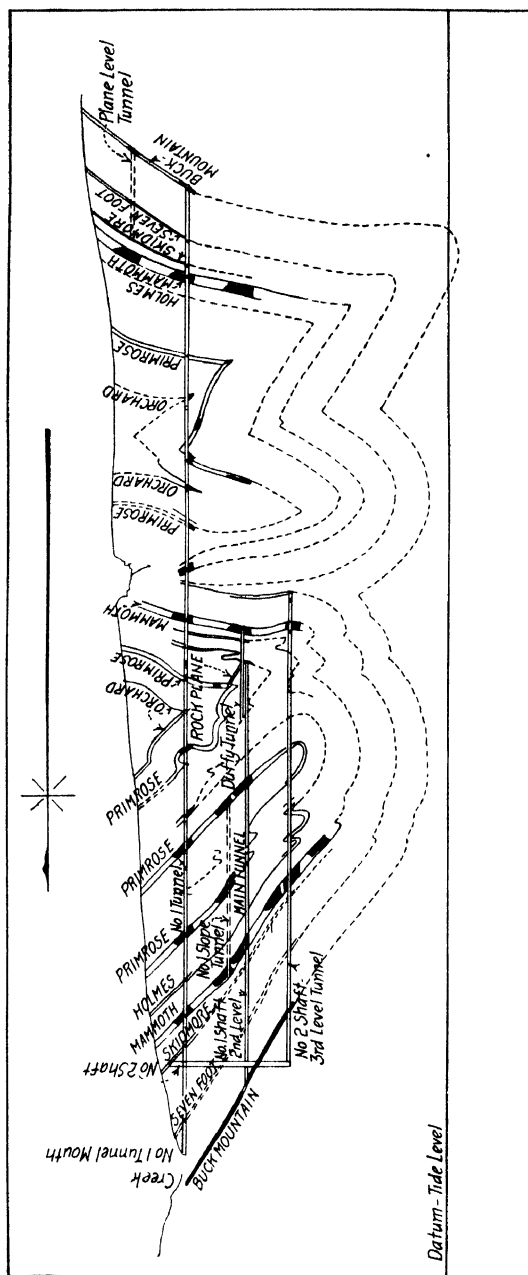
CROSS-SECTION K-K, NESQUEHONING TUNNEL.
